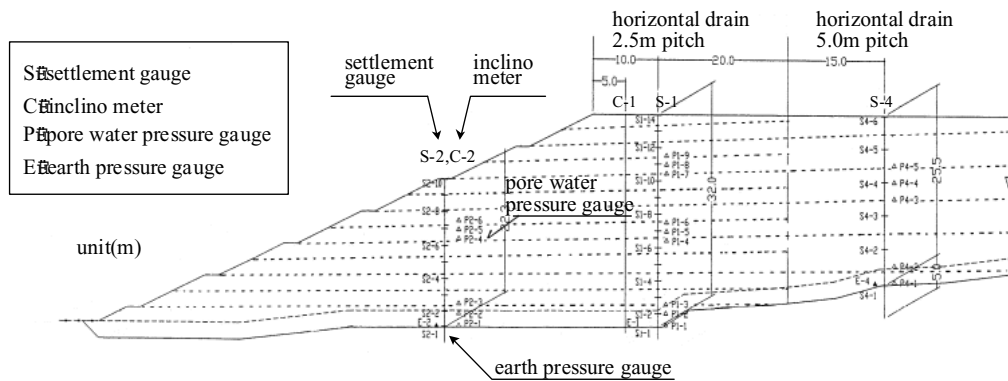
Outline of the test embankment and arrangement of monitoring gauges
